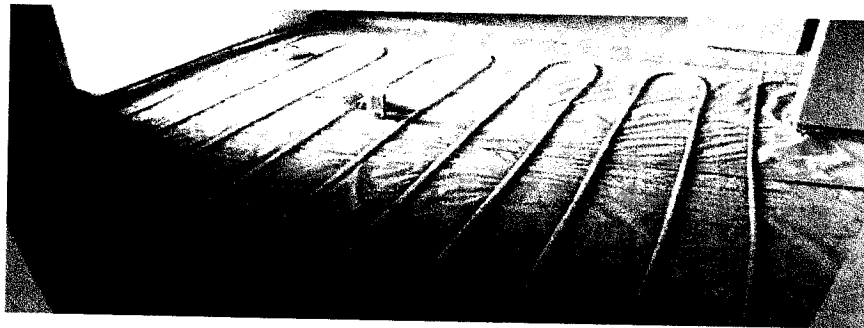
PEX tubing laid out in foyer before concrete poured.
